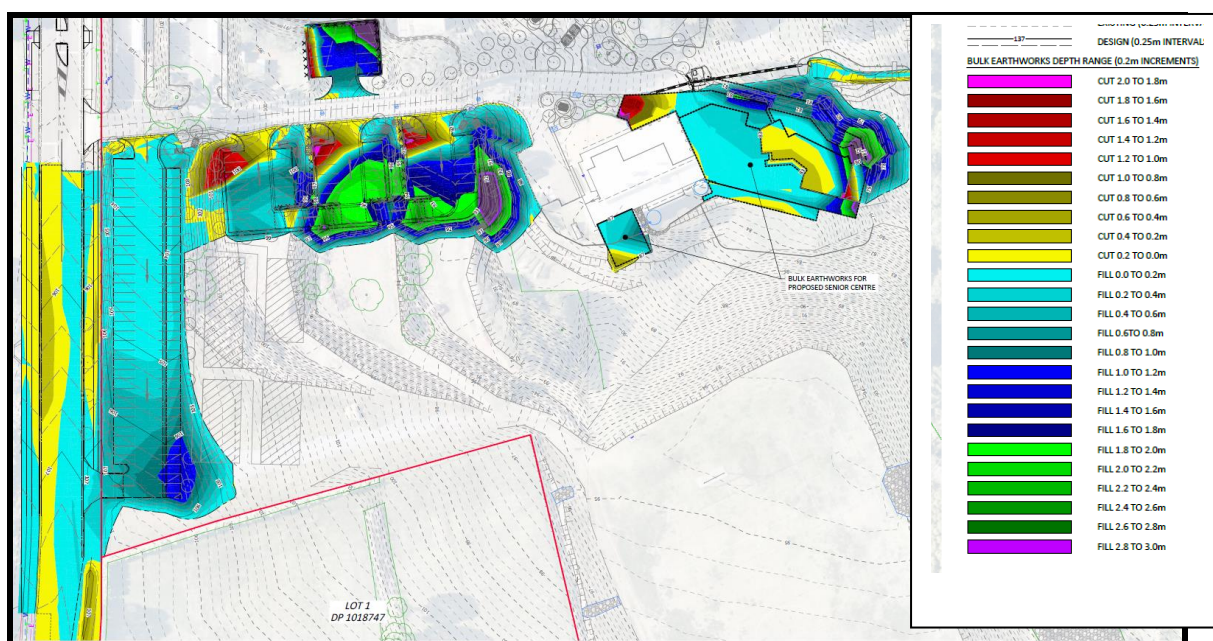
Proposed Cut and Fill (Source: Revised Engineering Plans, NDC, 23 February 2023)
